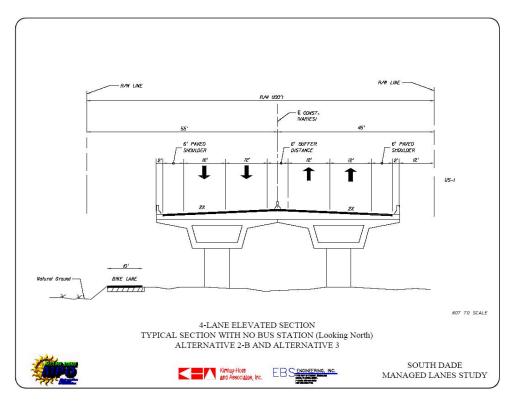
Typical Cross Section of the Four-Lane Elevated Alternative
